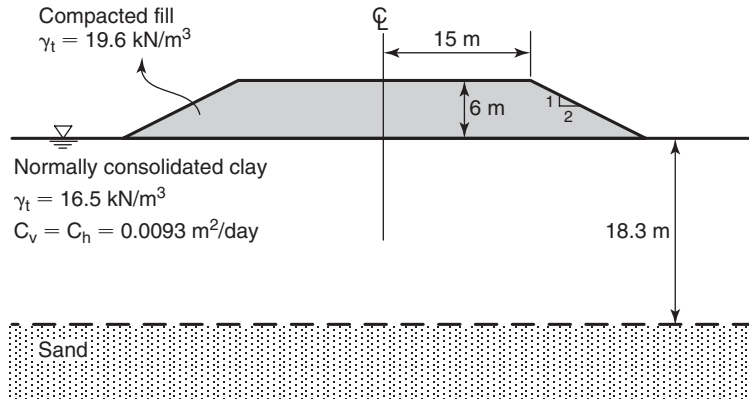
Highway embankment for prefabricated vertical drain problem.
